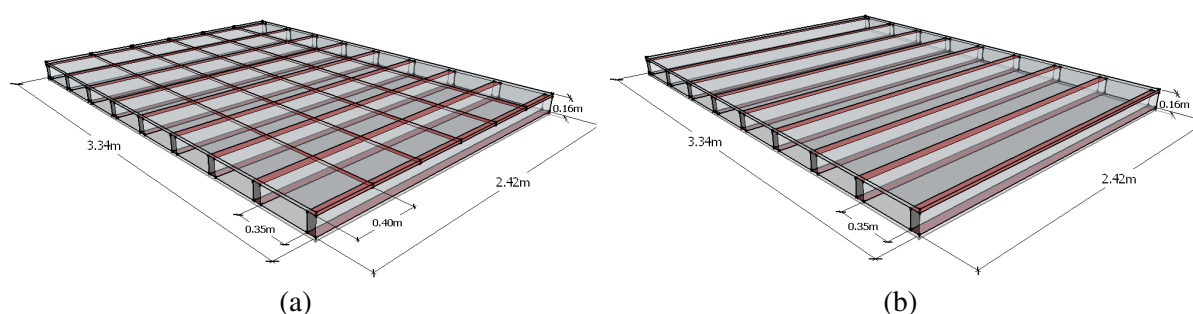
Schematic geometry of the timber-frame with (a) multi-plate timber-board; (b) single plate timber-board
